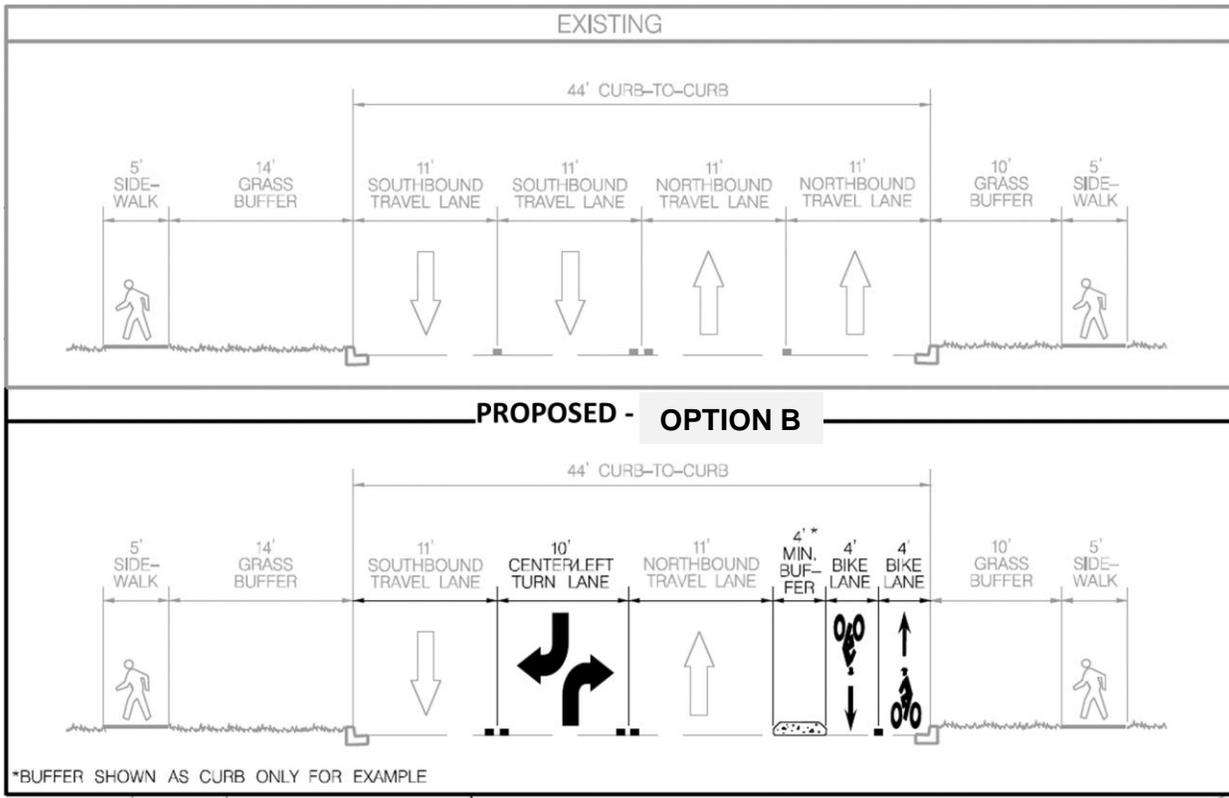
Proposed typical cross-section for Oakland Mills Road – Option B
